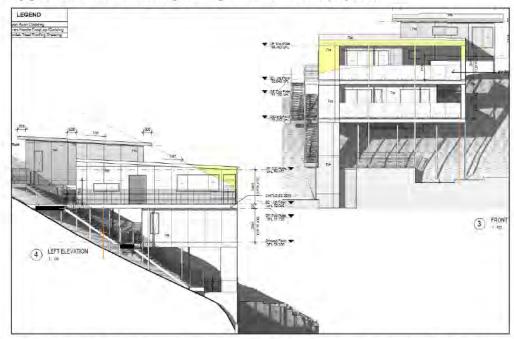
Elevation plan of the proposed dwelling, with the yellow area indicating the area above the 9m height limit
